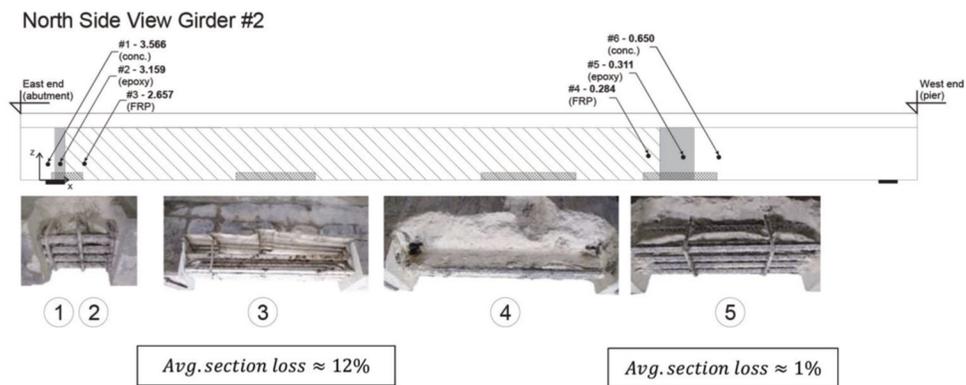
The state of reinforcement and chloride contents at different locations of a corroded bridge girder [83]
